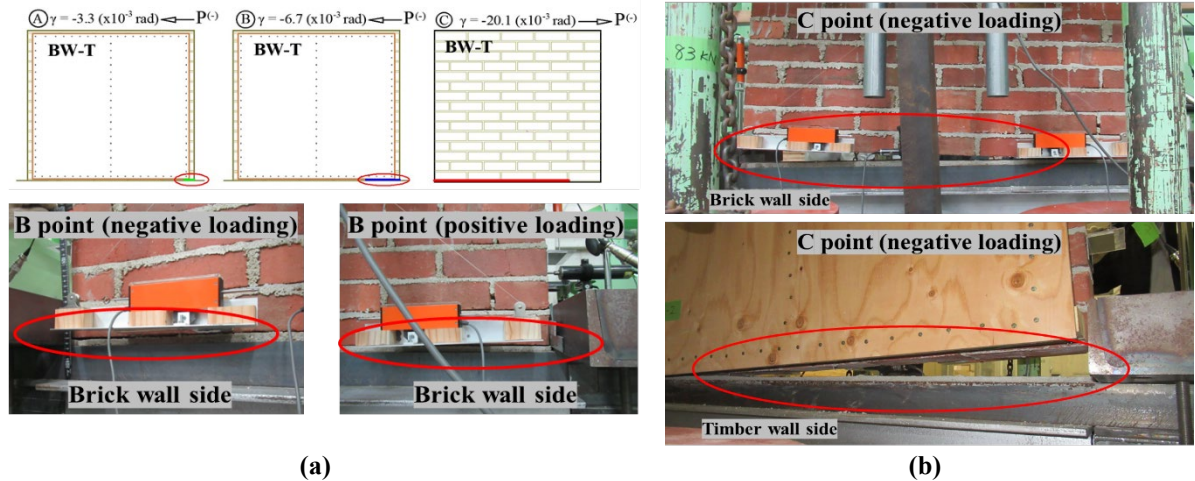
Failure and crack pattern of BW-T wall. (a) Scheme of crack pattern and photo of crack at uplift (B point); (b) Photo of failure at the maximum load.
